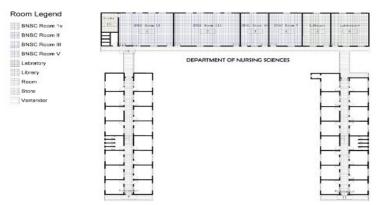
The floor plan, Nursing Department, Faculty of Medicine U.J. Source: Author's fieldwork, 2016.
